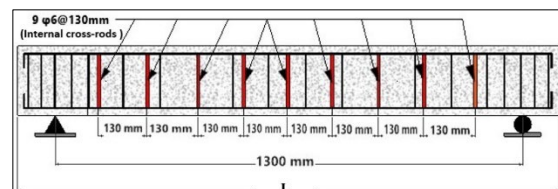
Beam Specifications and Reinforcement (B-9CR).
